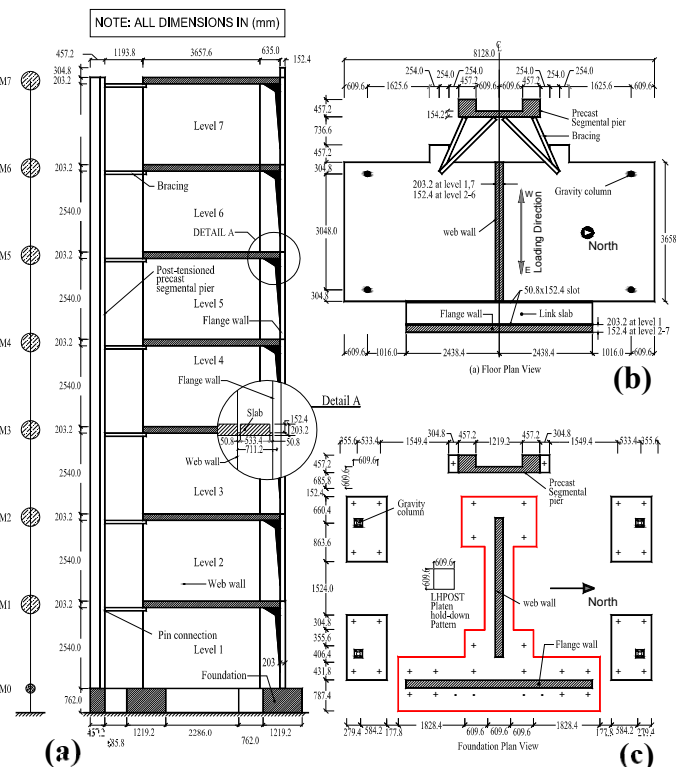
Test structure: (a) Elevation; (b) Floor plan view; and (c) Foundation plan view
